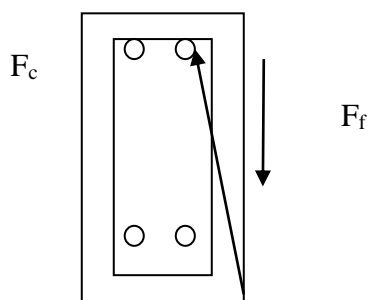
Forces acting on the cross section of a beam at failure. F_f is the force acting on the CFRP and F_c is the force acting on the concrete rod.
